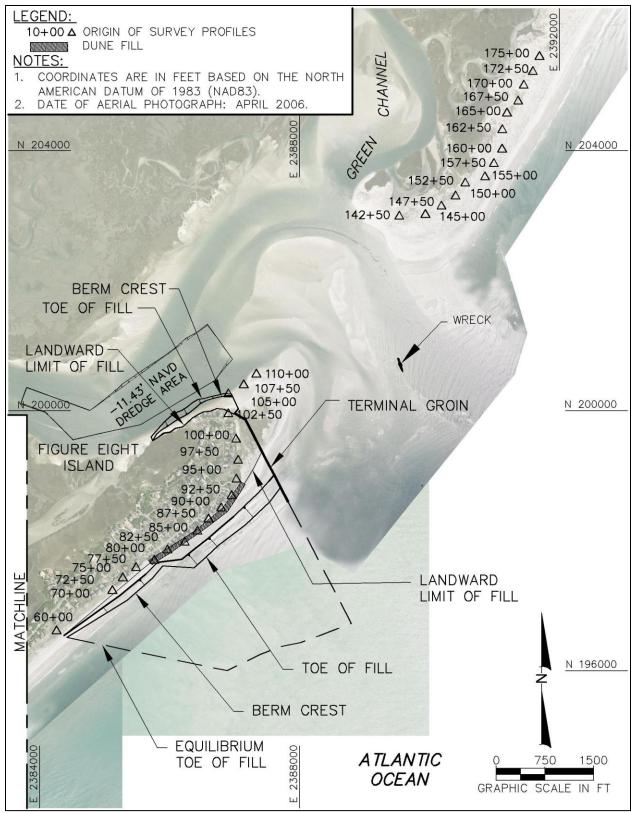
Plan View of Alternative 5B; 2006 shoreline conditions.
